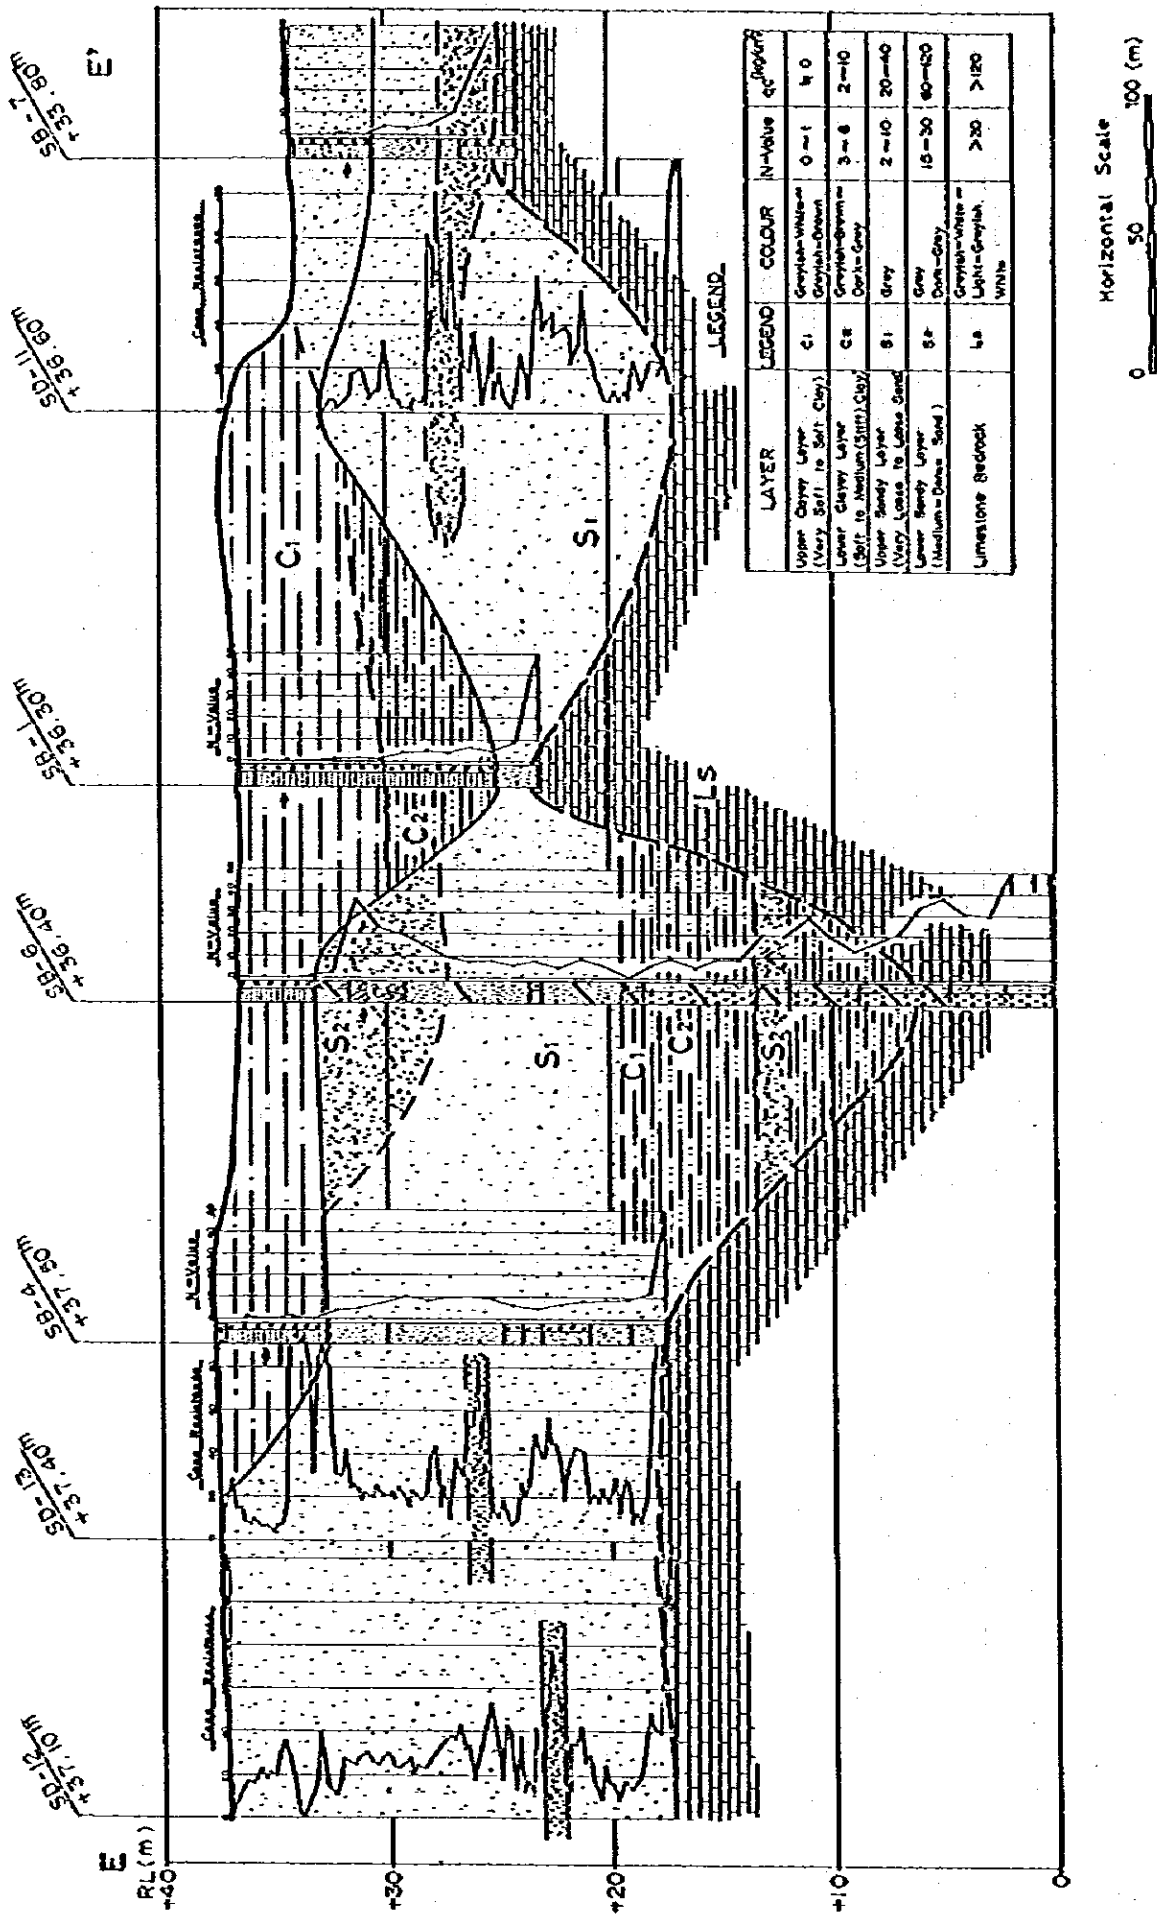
Soil Profile at Sentul, Cross Section E-E'
